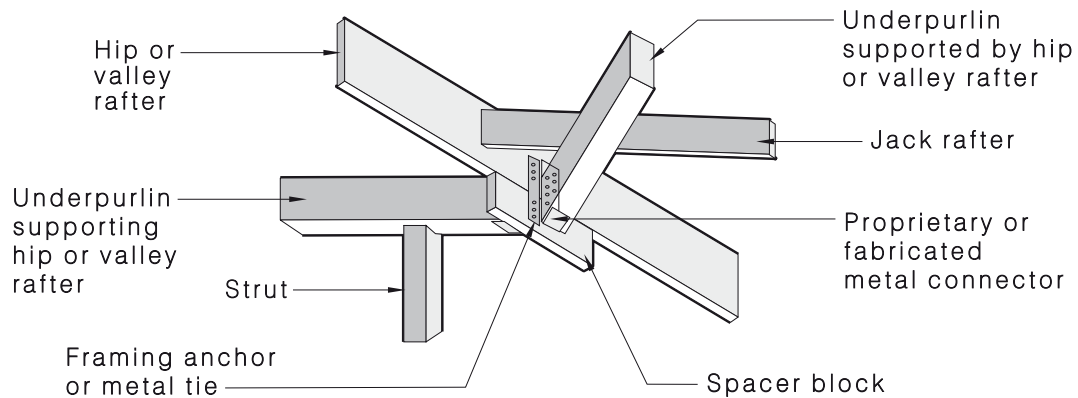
TYPICAL UNDERPURLIN CONNECTIONS TO HIP OR VALLEY
